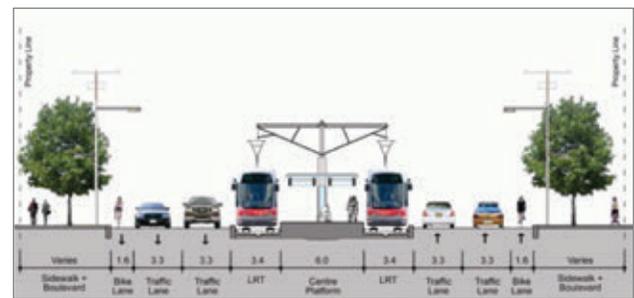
Figure A – Typical cross-section of an LRT stop<sup>1</sup>
